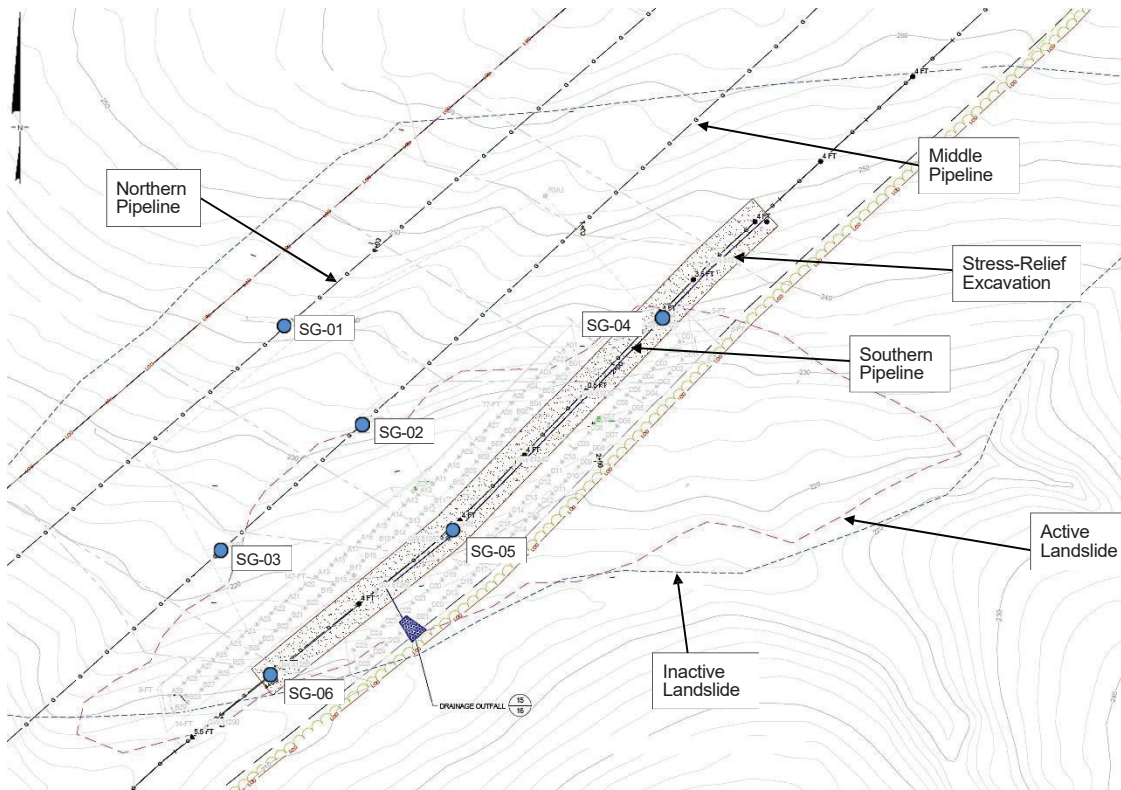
Landslide Boundaries, Extents of Stress-Relief Excavation and Subsurface Drainage Improvements
